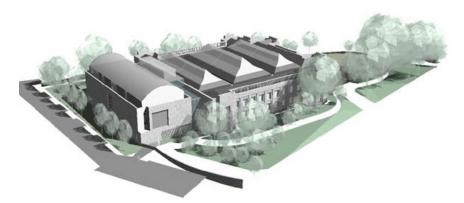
Great North Museum: Hancock, Newcastle upon Tyne. Concept design for the original building (pyramid roofed section) and extension (arched roof section). Terry Farrell and Partners ©
